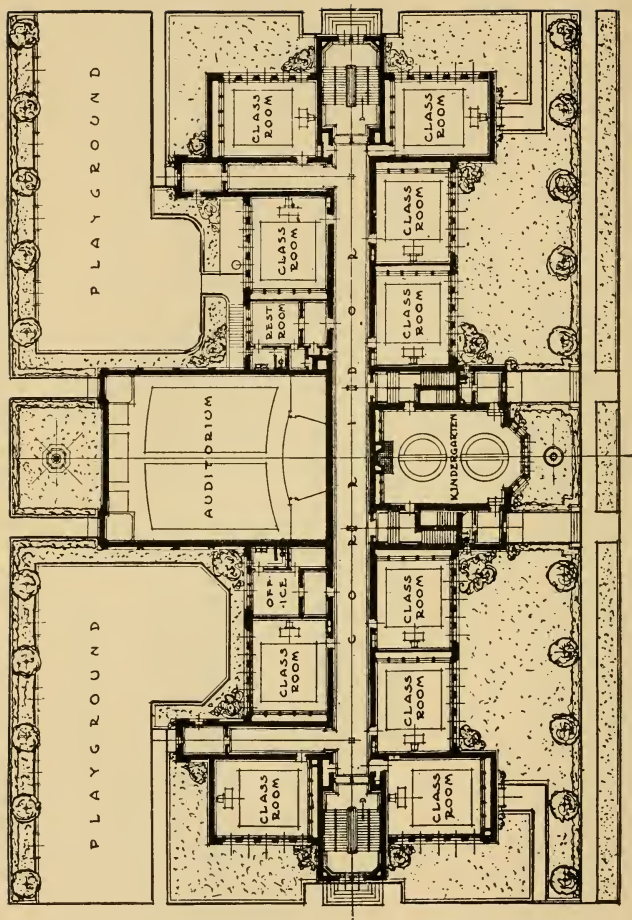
FIRST-FLOOR PLAN FOR THE EMPIRE SCHOOL, CLEVELAND
